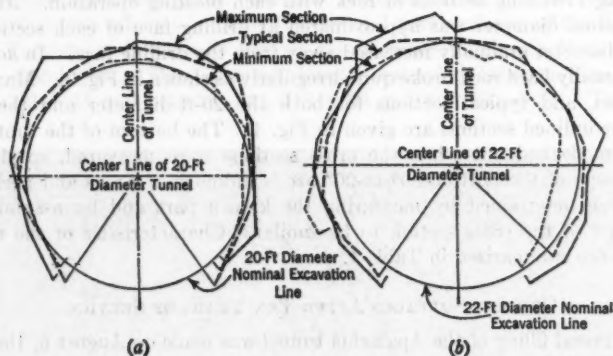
DIMENSIONS FOR UNLINED TUNNEL SECTIONS
